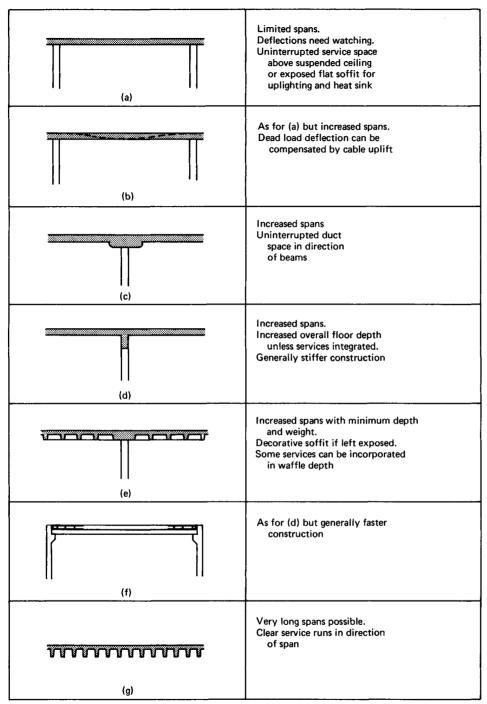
Concrete construction. (a) *In situ* reinforced concrete slab; (b) *in situ* prestressed concrete slab; (c) flat slab with shallow beams, reinforced or prestressed concrete; (d) *in situ* reinforced or prestressed concrete beam or slab; (e) waffle reinforced or prestressed concrete slab; (f) precast beam and slab; (g) precast T on double T
